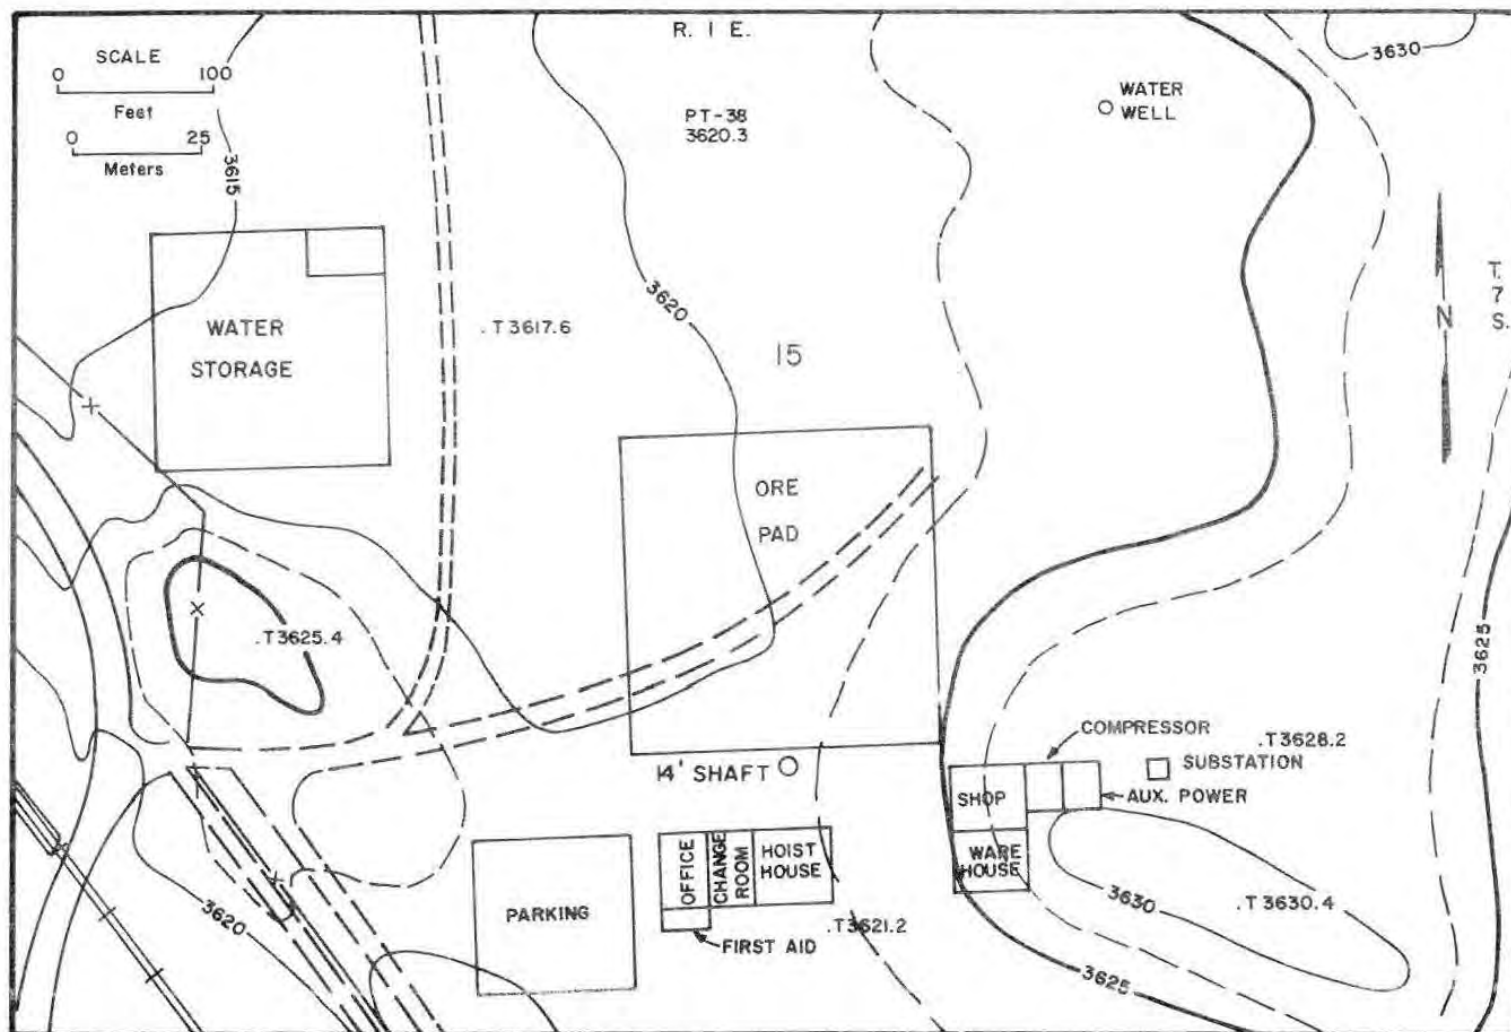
Proposed Initial Shaft Site Layout
